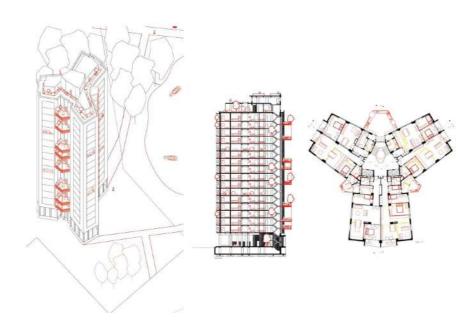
Parasite-strategy in combination with activation of nature: addition of trapezium shaped (green) balconies in the armpits of the towers of the Jan De Voslei in Antwerp; isometric drawing, section and floor plan. Source: Selina Steegen and Kimberly Lievens
